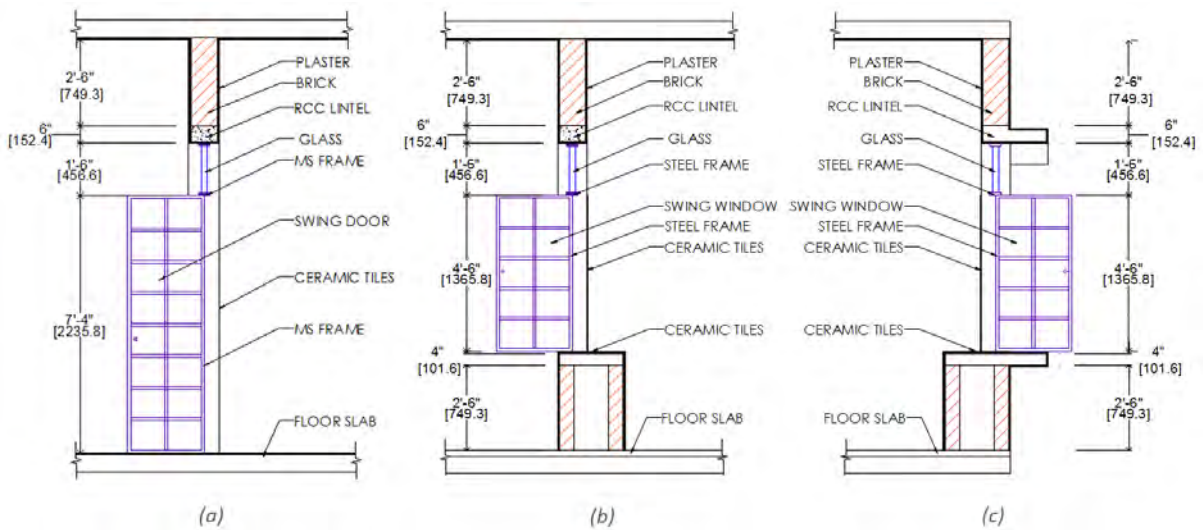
Inpatient room of Neurosurgery envelope section. (a) Door section on corridor side (b) window section on corridor side (c) window section on exterior wall.
